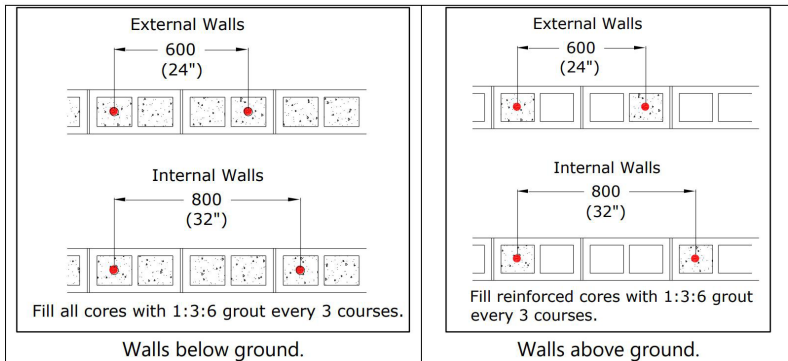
PLAN OF CONCRETE BLOCK
